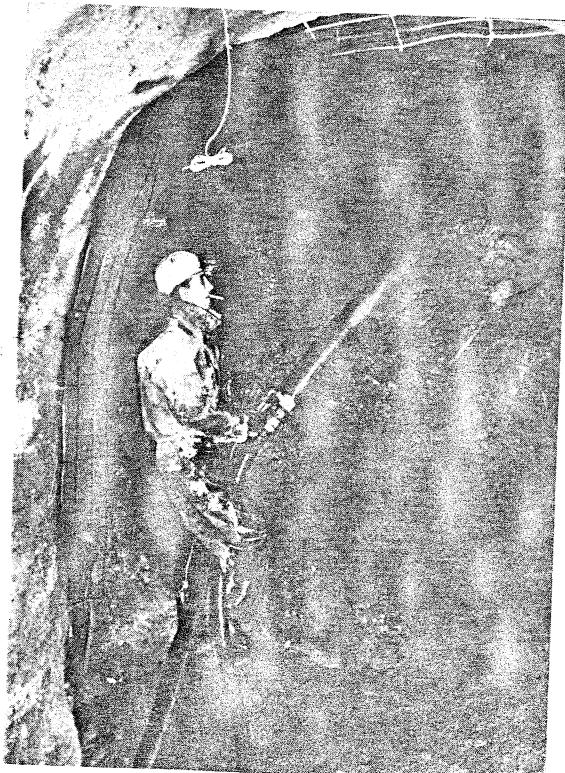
Tunnel wall receiving surface protection by a shotcrete layer immediately after mucking out
